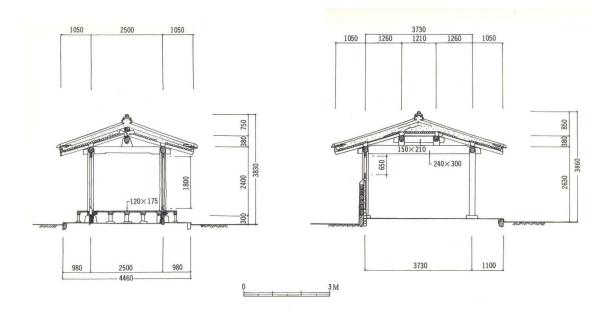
Banbingan/Kitchen & Dinning Section (N. Zu 2003)
